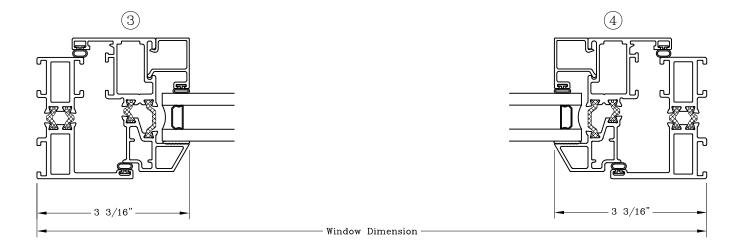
/2 Scale - For Custom Size Drawing Contact Graham Note: Sealant Not Shown On Details. Refer To General Installation Instructions.
